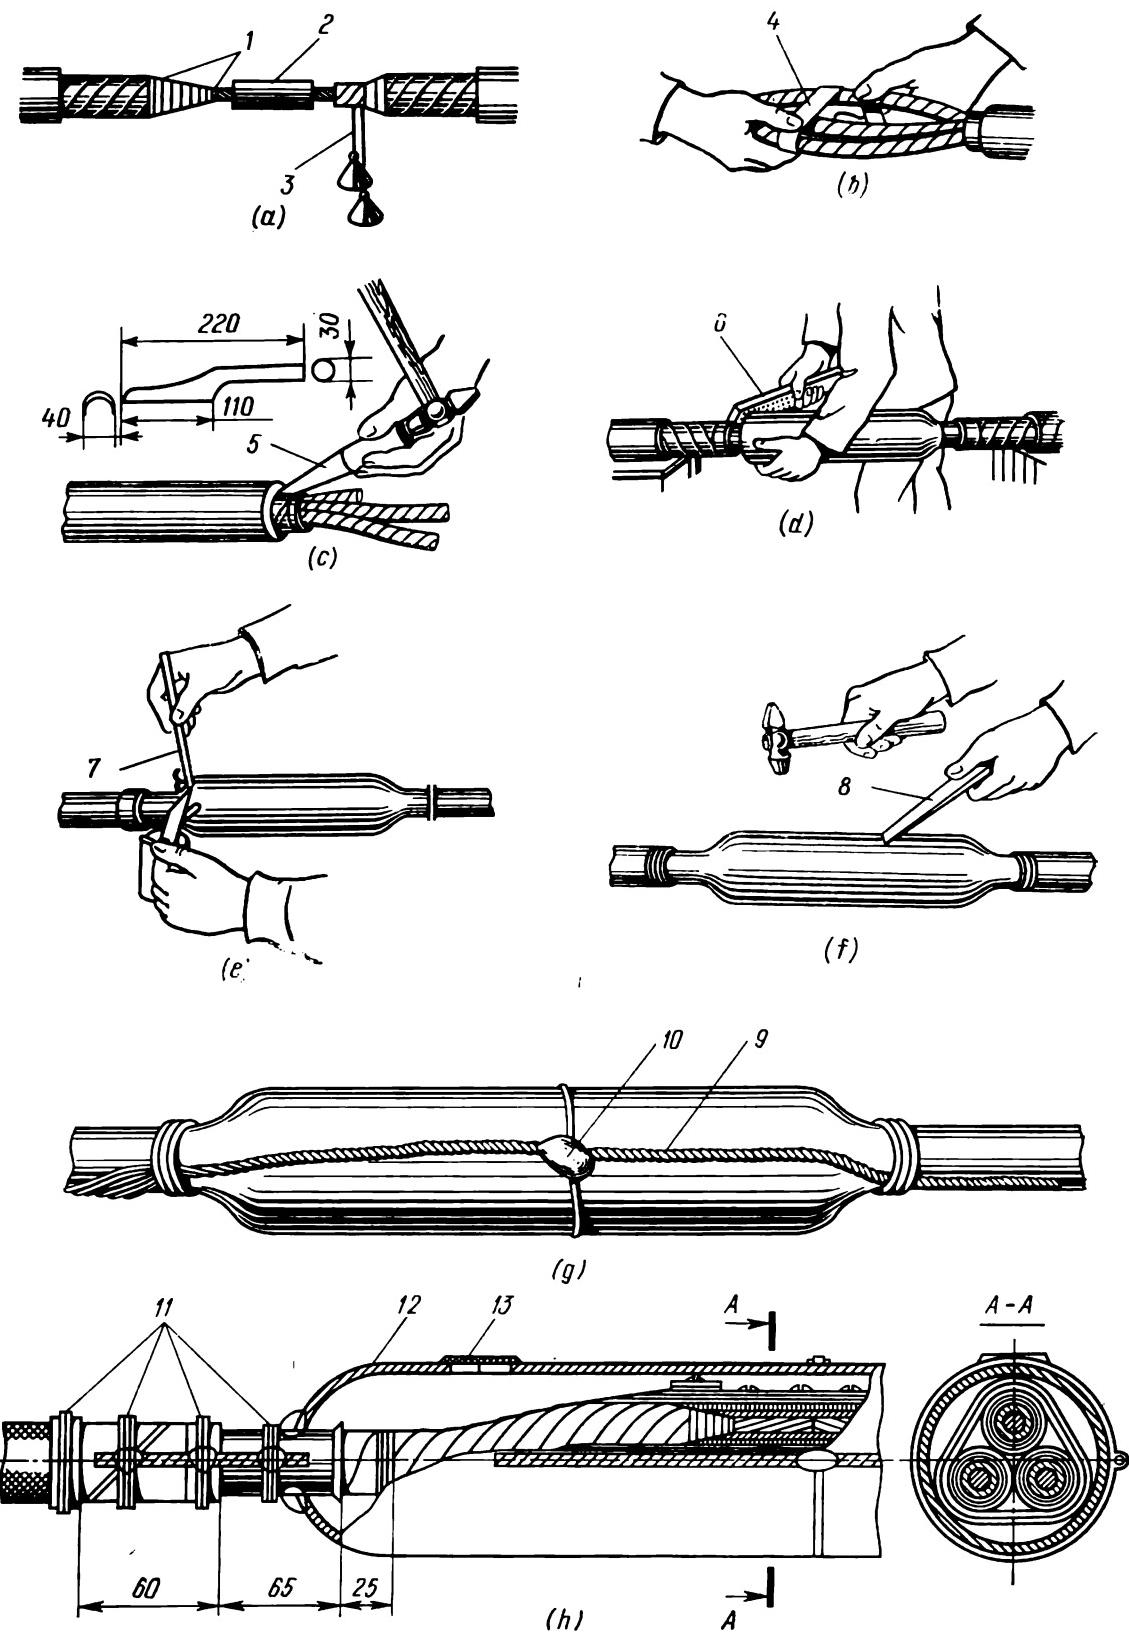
Installation of jointing lead sleeve for 6-, and 10-kV cables
